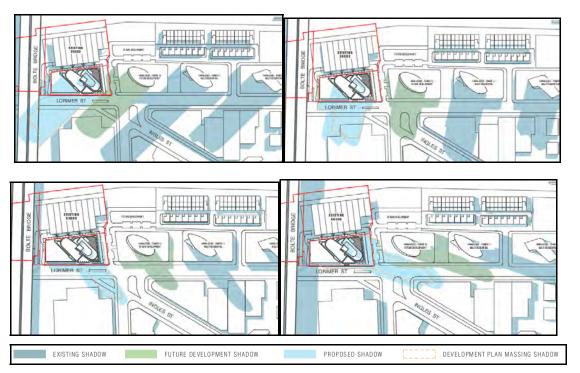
Shadowing from proposed built form compared with indicative Development Plan shadow diagrams
